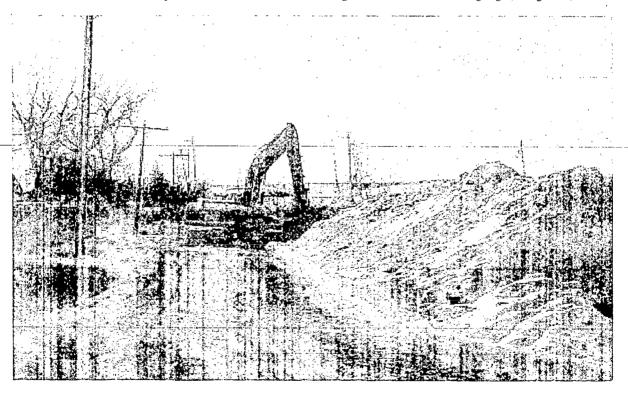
General view of impacted area located southwest of Village of Gilberts Public Works garage (facing north).
